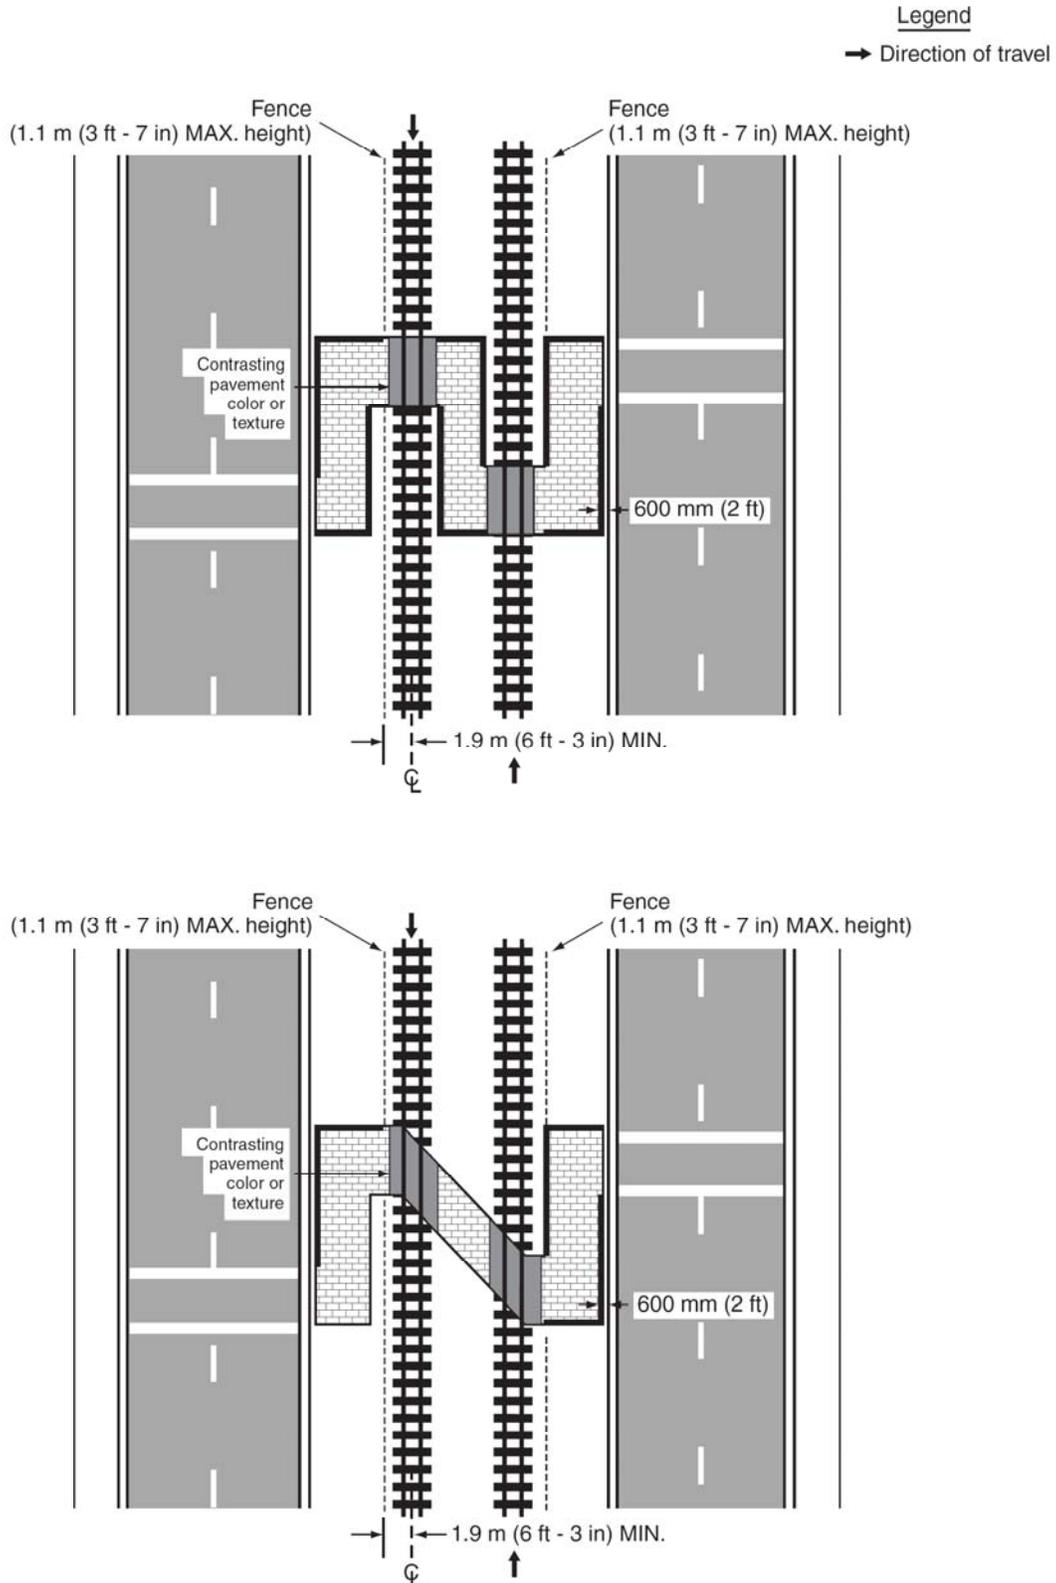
D-8. Examples of Pedestrian Barrier Installation at an Offset Nonintersection Light Rail Transit Crossing
